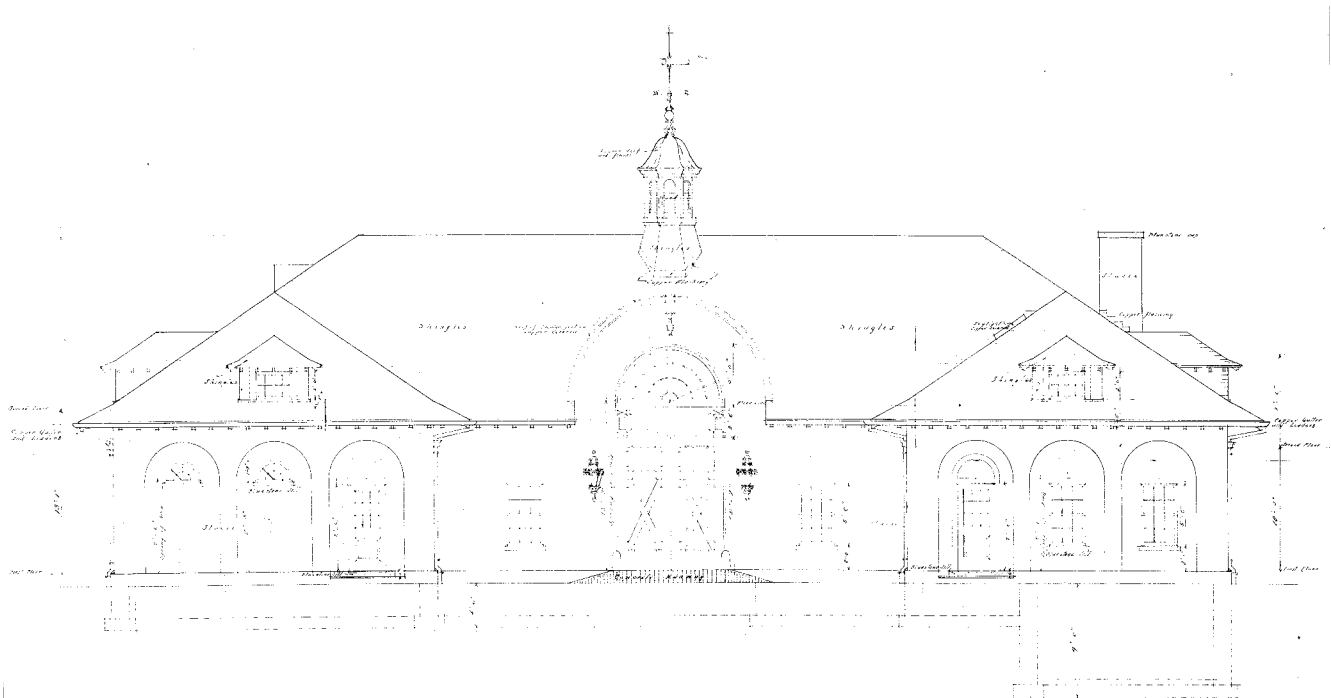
North Elevation of Carriage House from Delano & Aldrich's construction drawings. (Merestead archives)
